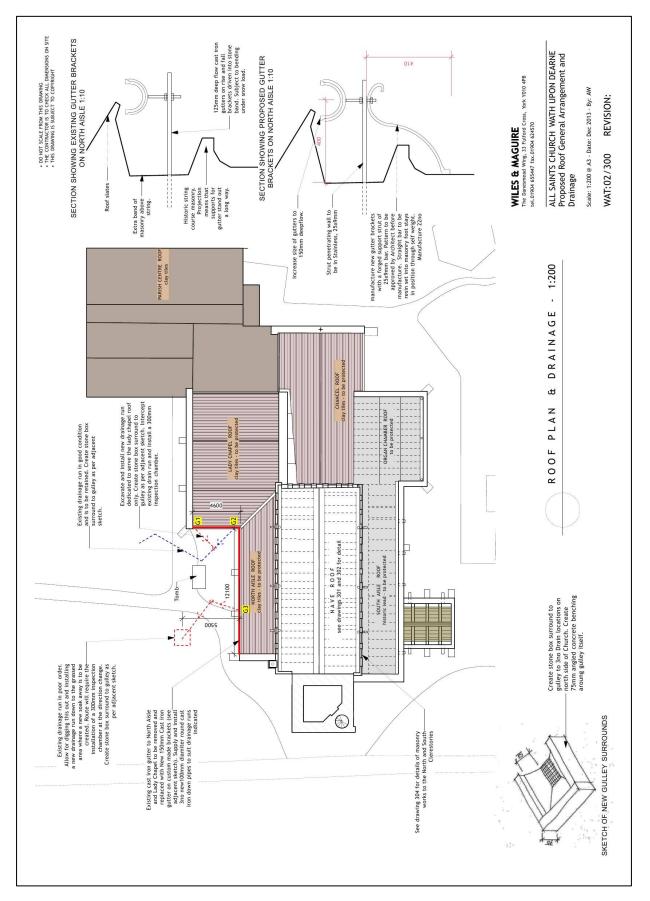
PROPOSED DRAINAGE WORKS (Plan supplied by Wiles and Maguire, Project Architects)
